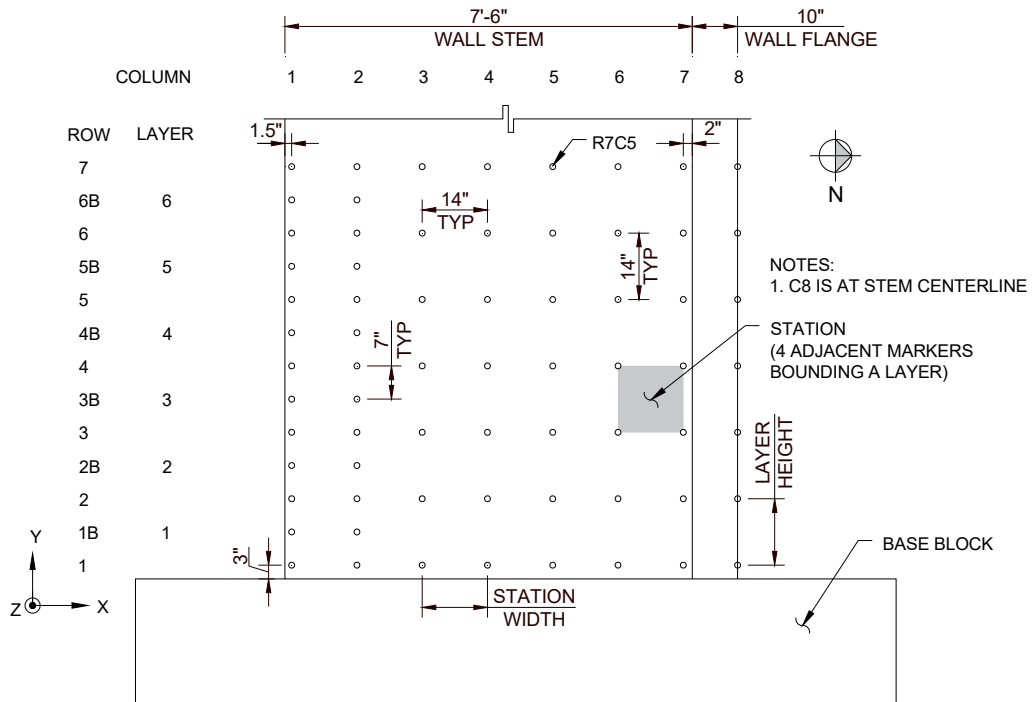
Locations of optical markers on wall stem (1 in. = 25.4 mm)
